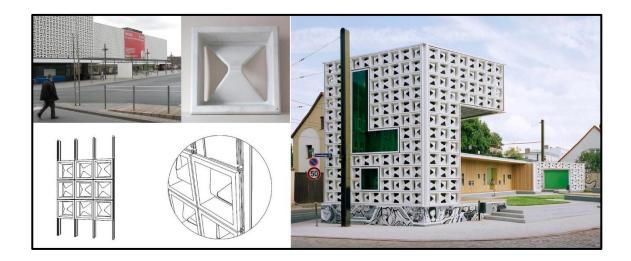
Façade molds from the demolished Horten Department Store was used on the Open Air Library [280]
